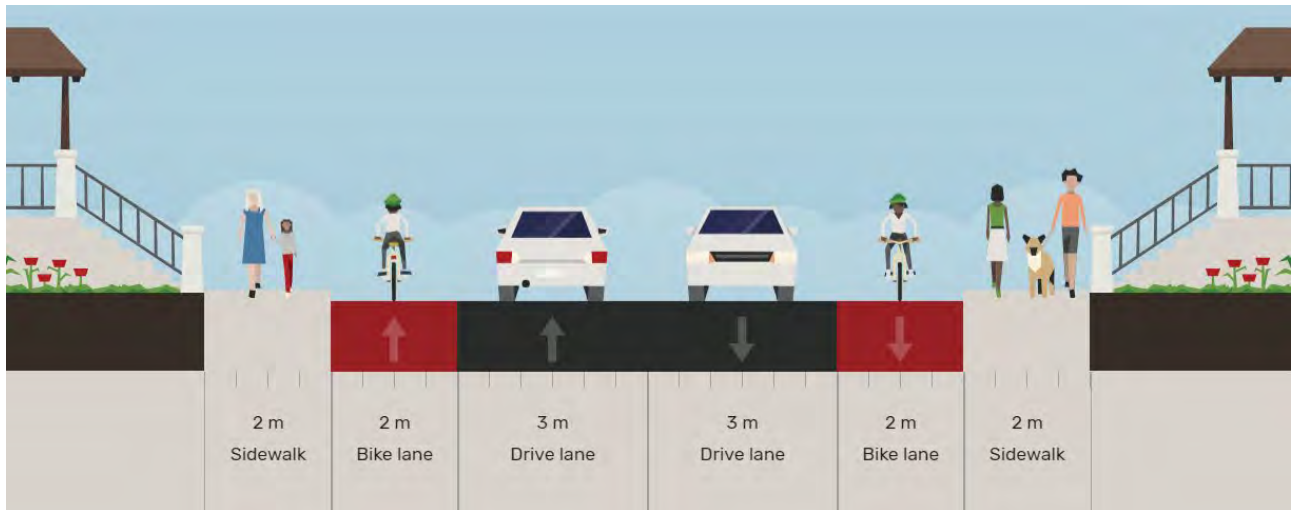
Church Road/Rock Road Option 3 - Cross-section
